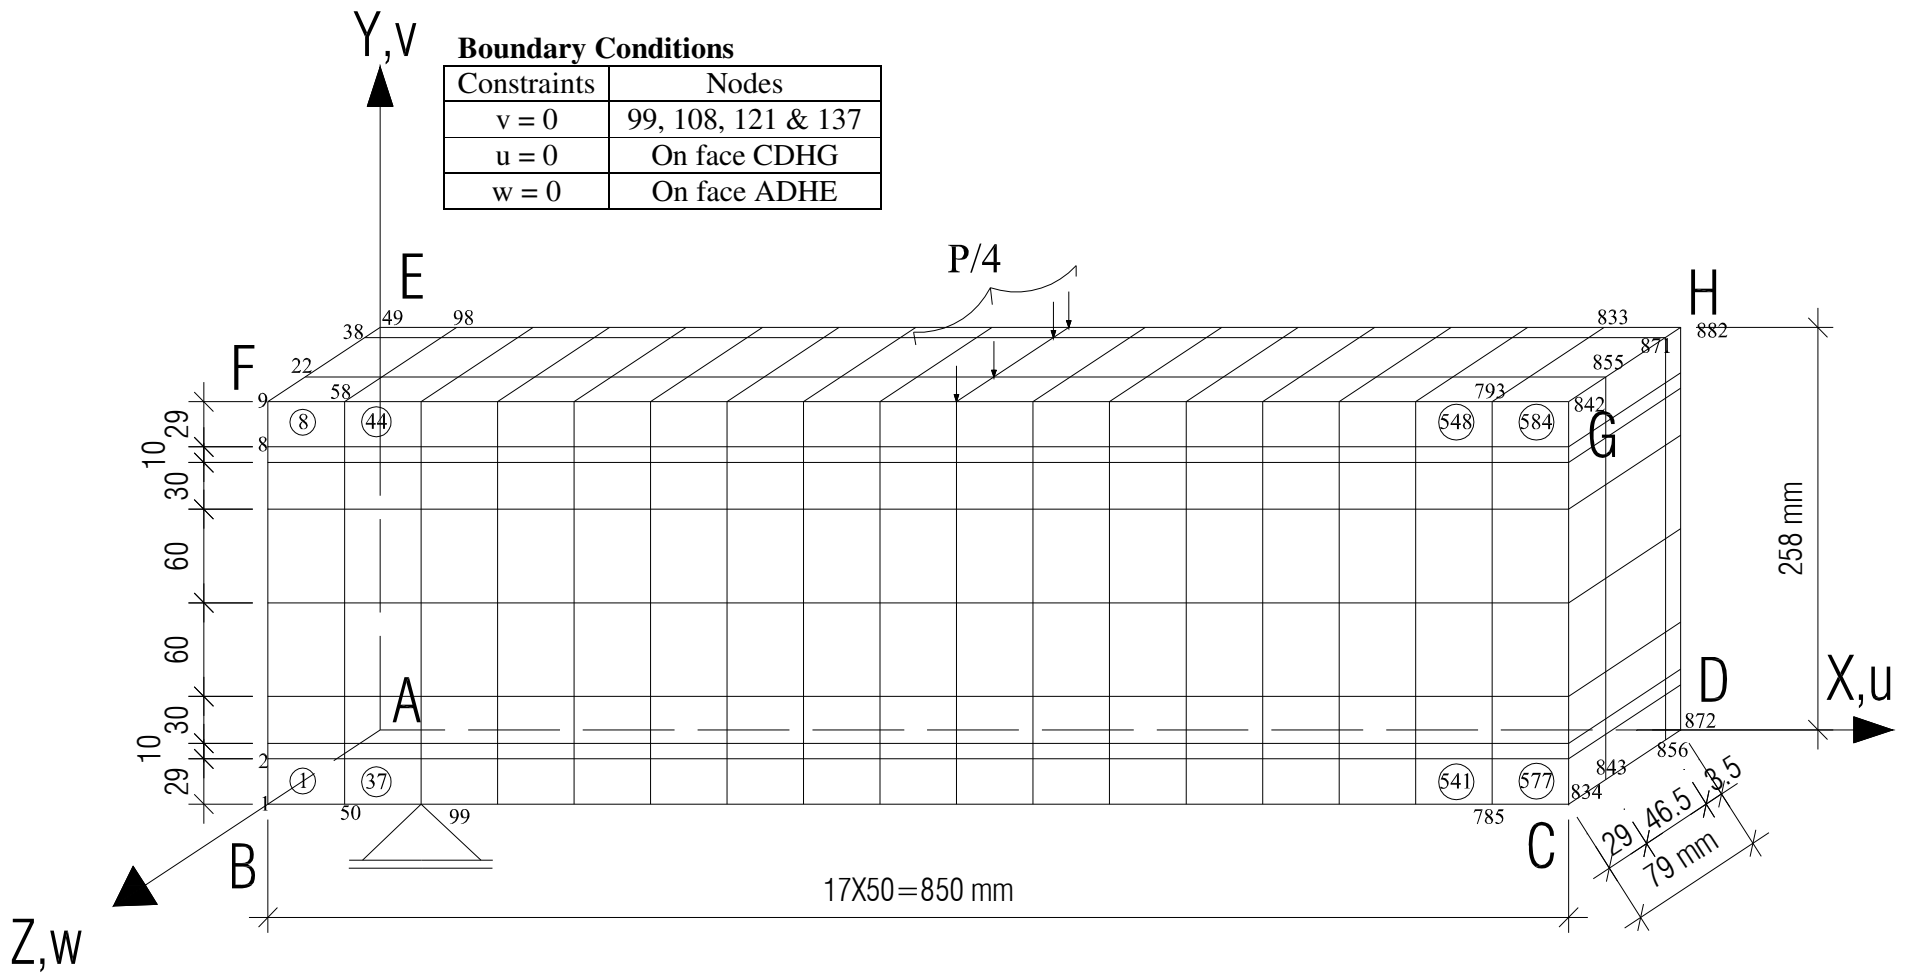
Finite Element Meshing for One-Fourth of the Concrete Encased Steel Beam
